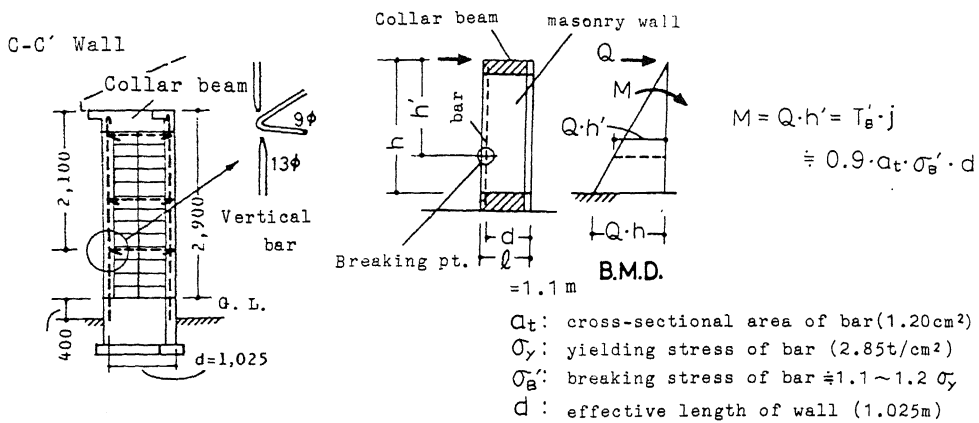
Situation of C-C' wall where vertical reinforcing bar was torn off and formula to estimate force applied to the wall
